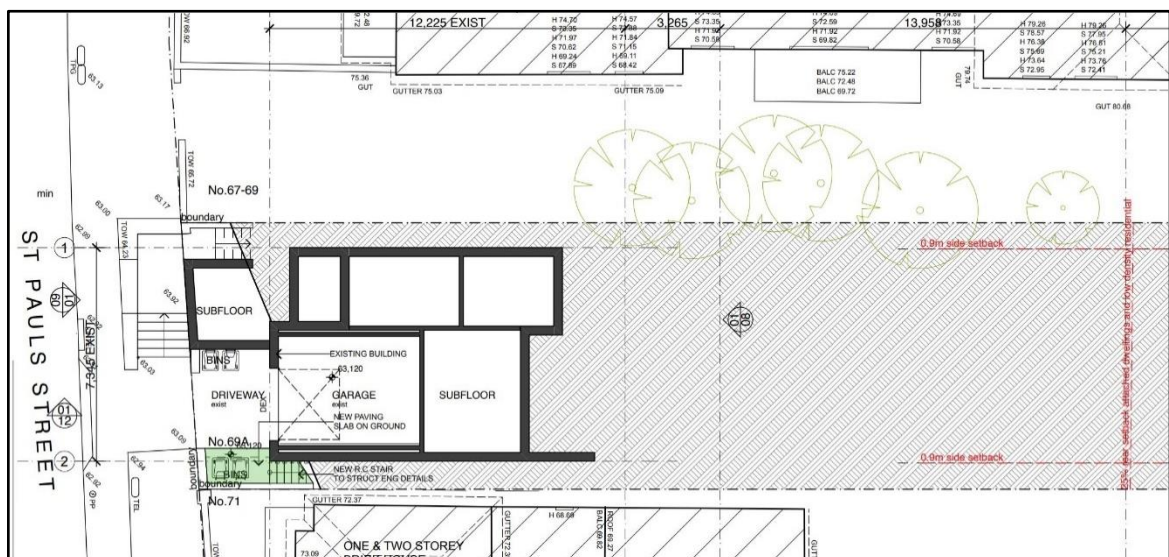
Garage Plan (Rev B), 2/11/2023 (Fortey & Grant Architecture)
